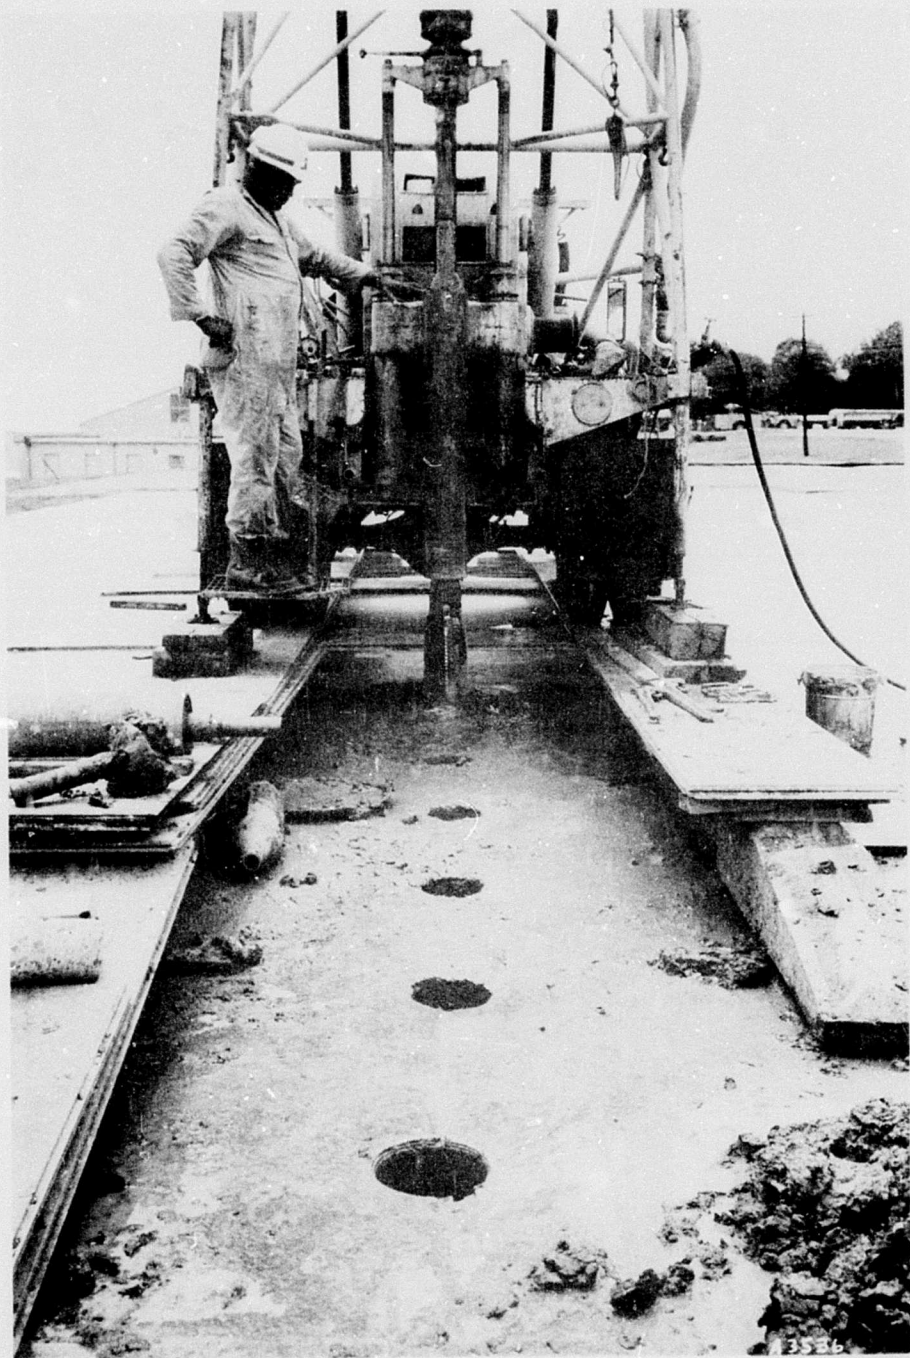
Underreaming device being lowered into position above 8-in.-diam hole.
